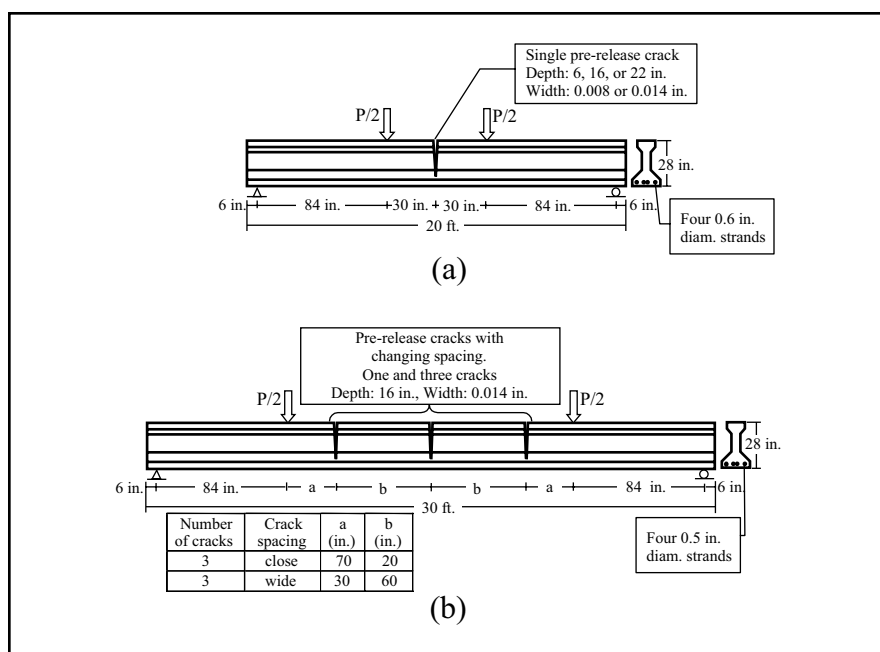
Details of test beams: (a) single crack series beams; (b) multiple crack series beams.
